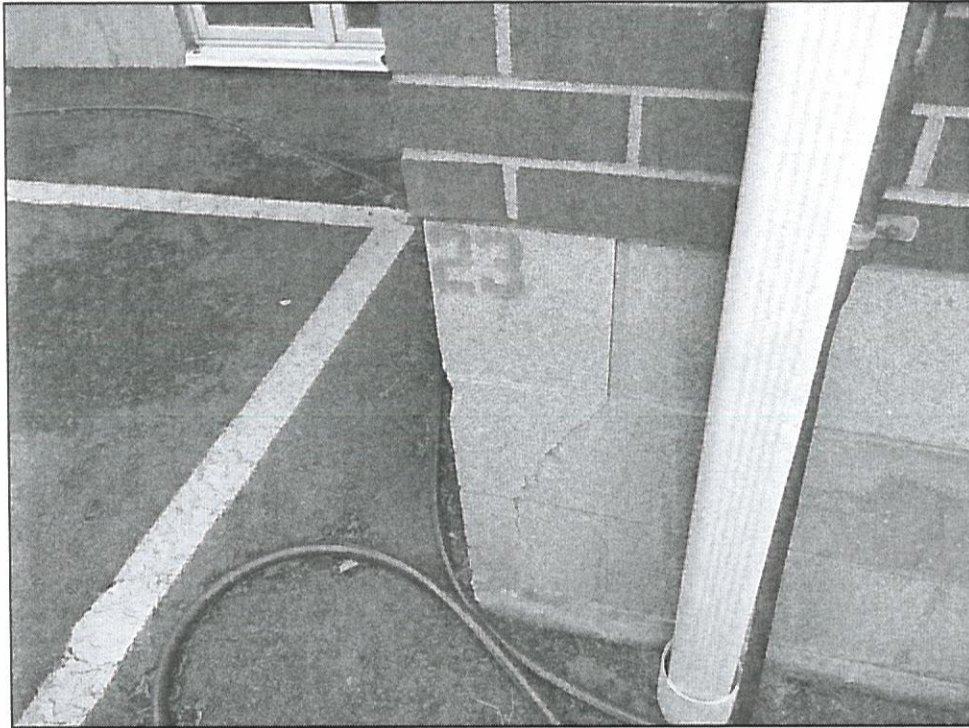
Corner Spalling at Foundation of the Original Building
